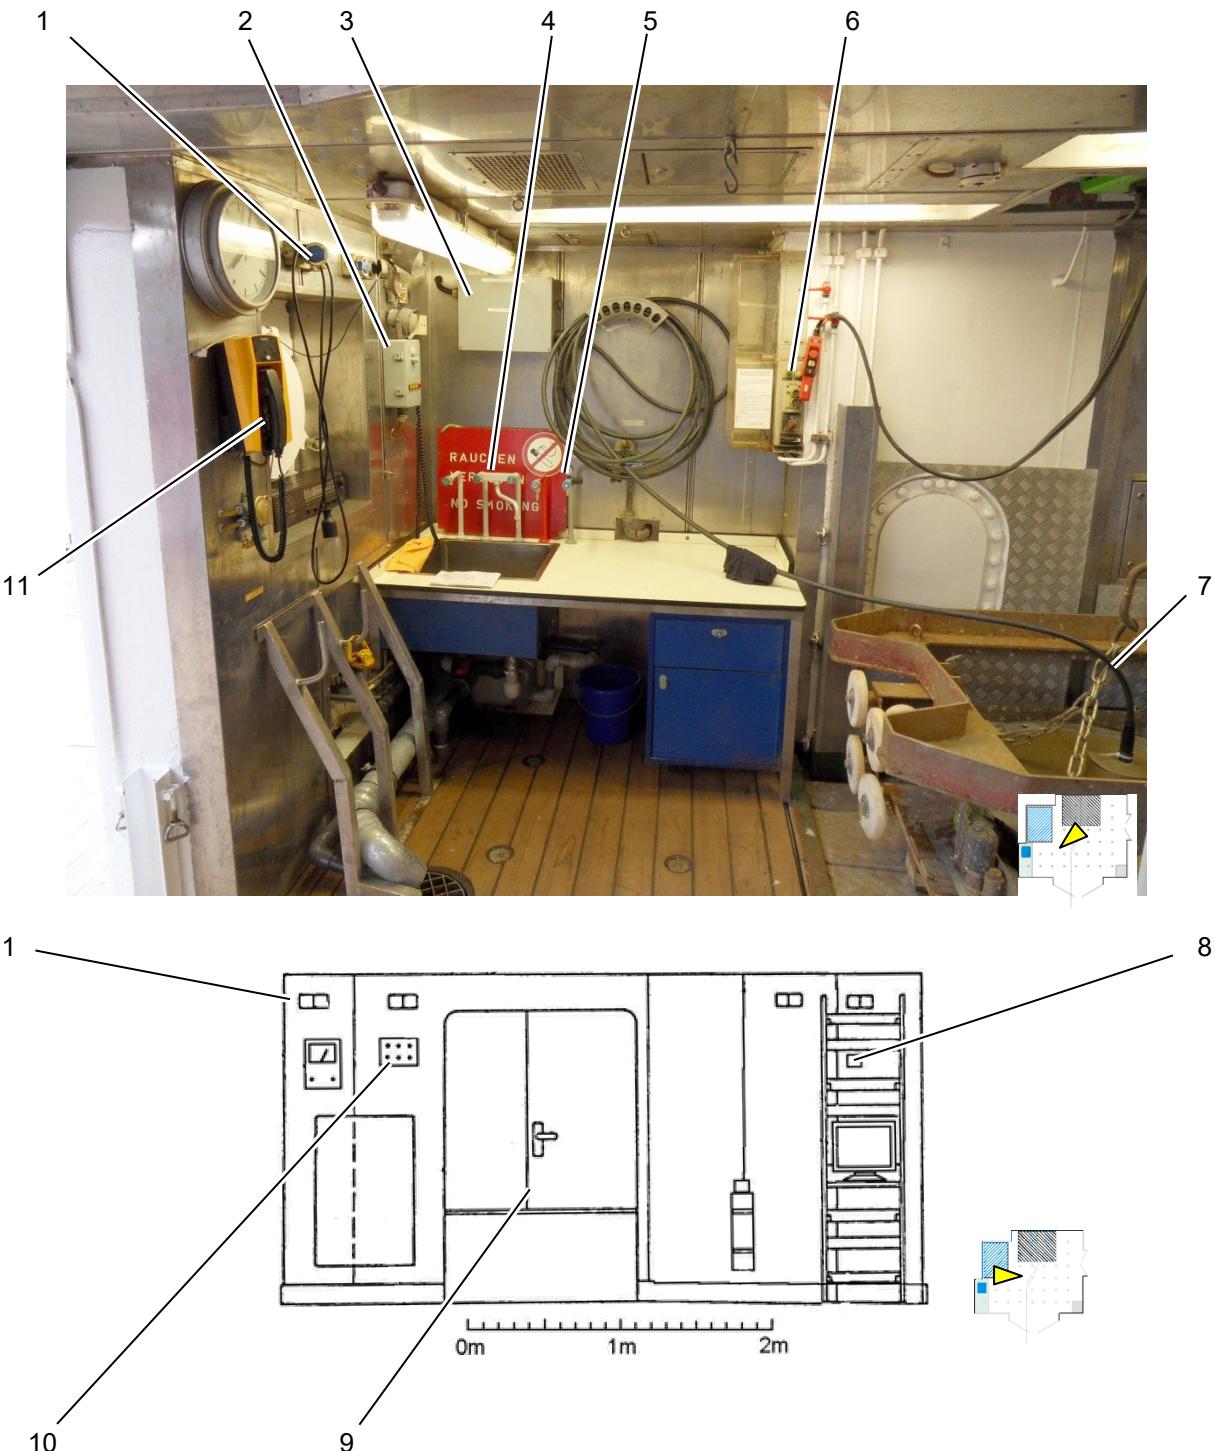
Filling room 17 (detailed plan laboratory walls, status 1986)
